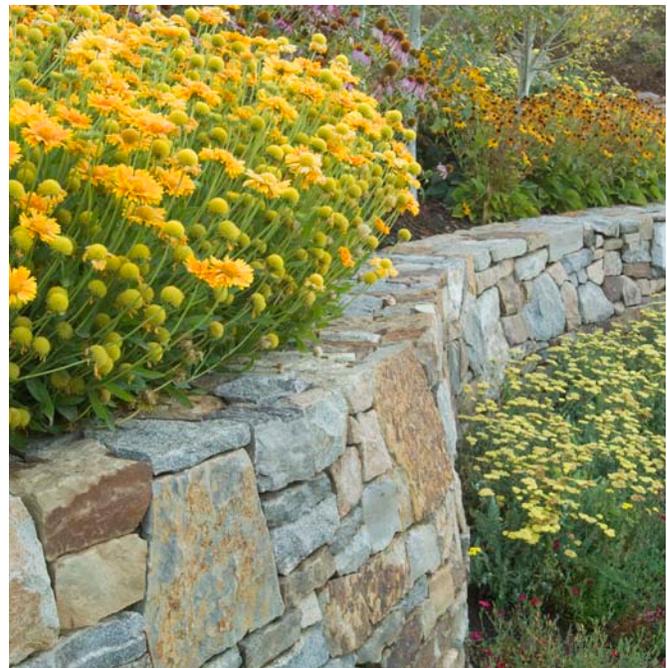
Walls shall be designed to blend in and complement building materials and colors. Curving wall layouts and incorporating landscape materials will help soften the contrast of the wall's vertical face.
